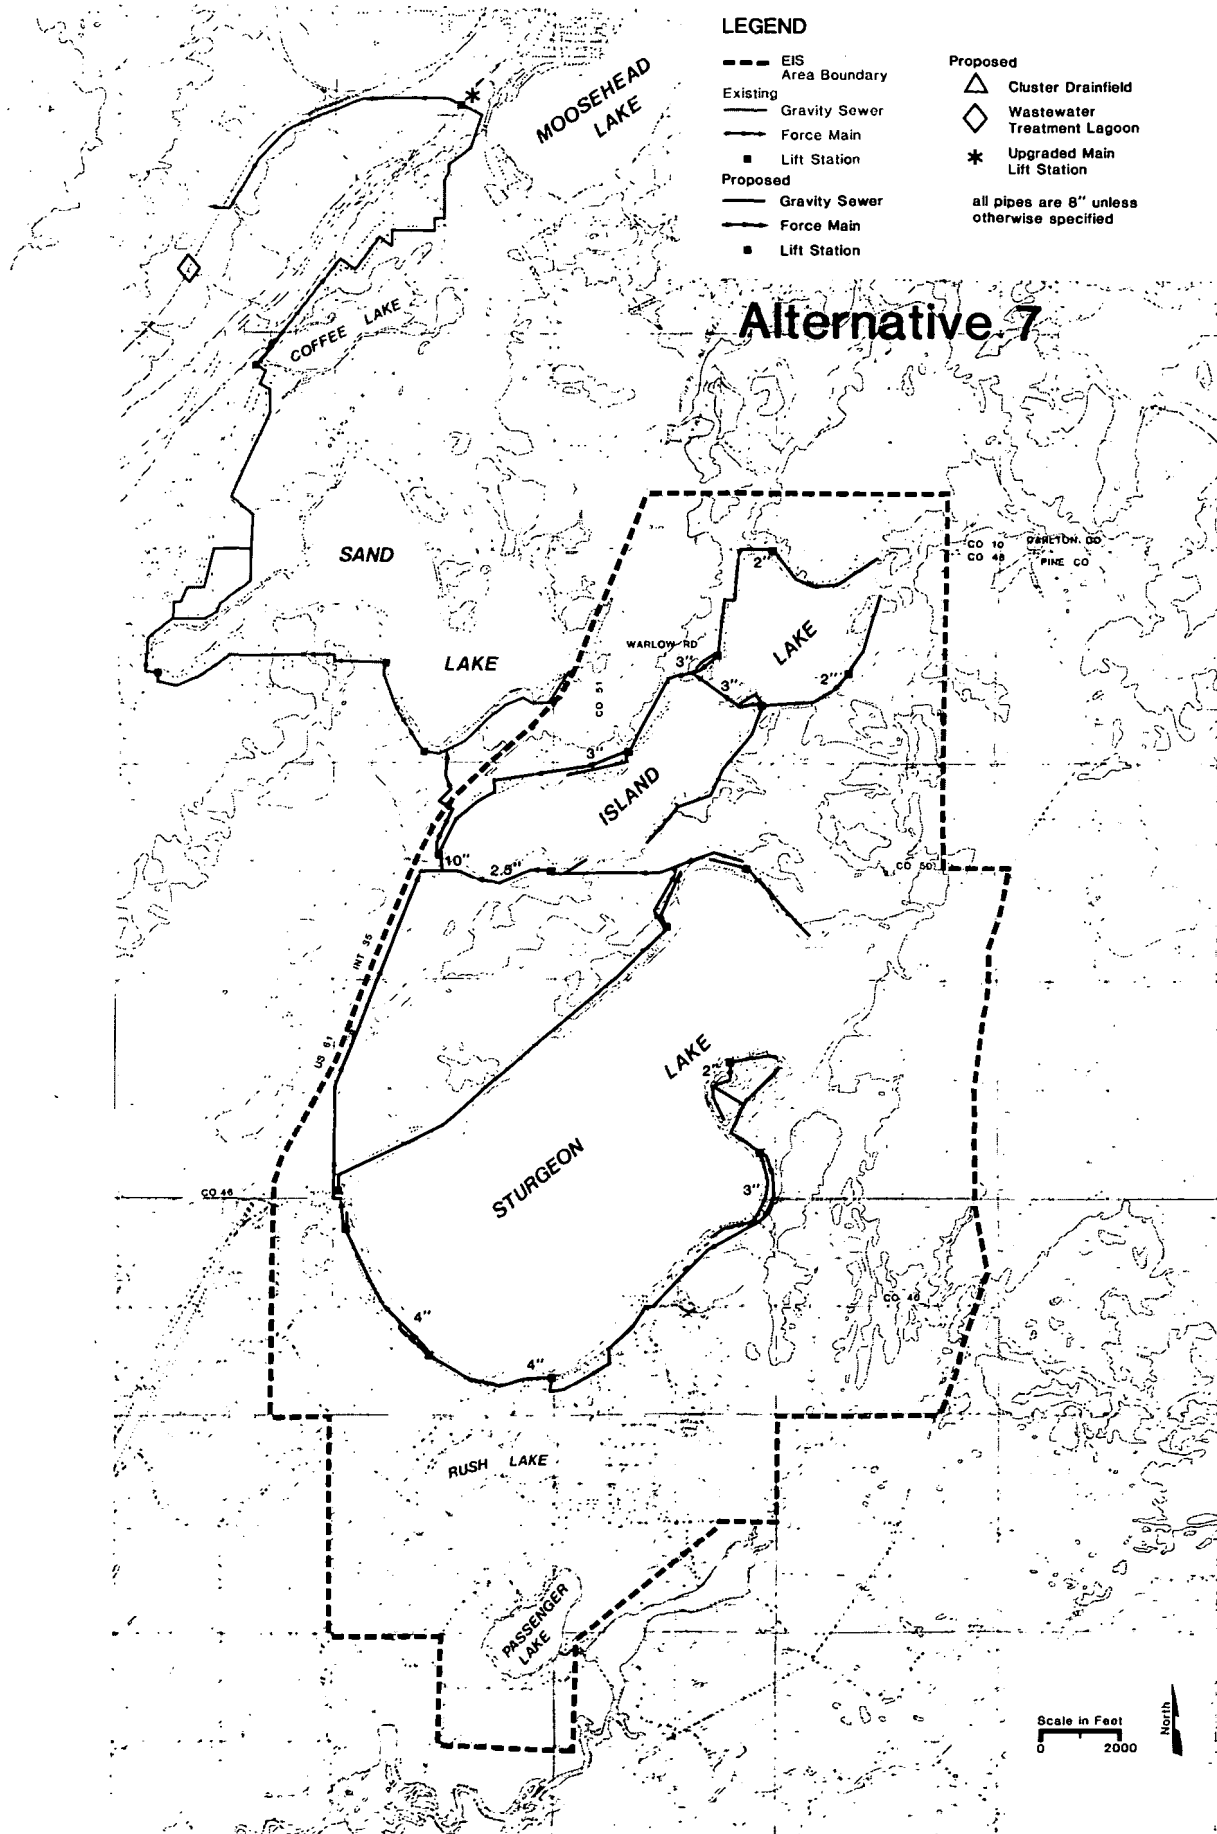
Wastewater collection and treatment facilities for Alternative 7
